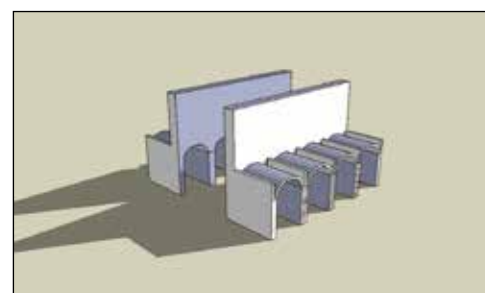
During construction, the walls of the nave were supported by the side chapels.
